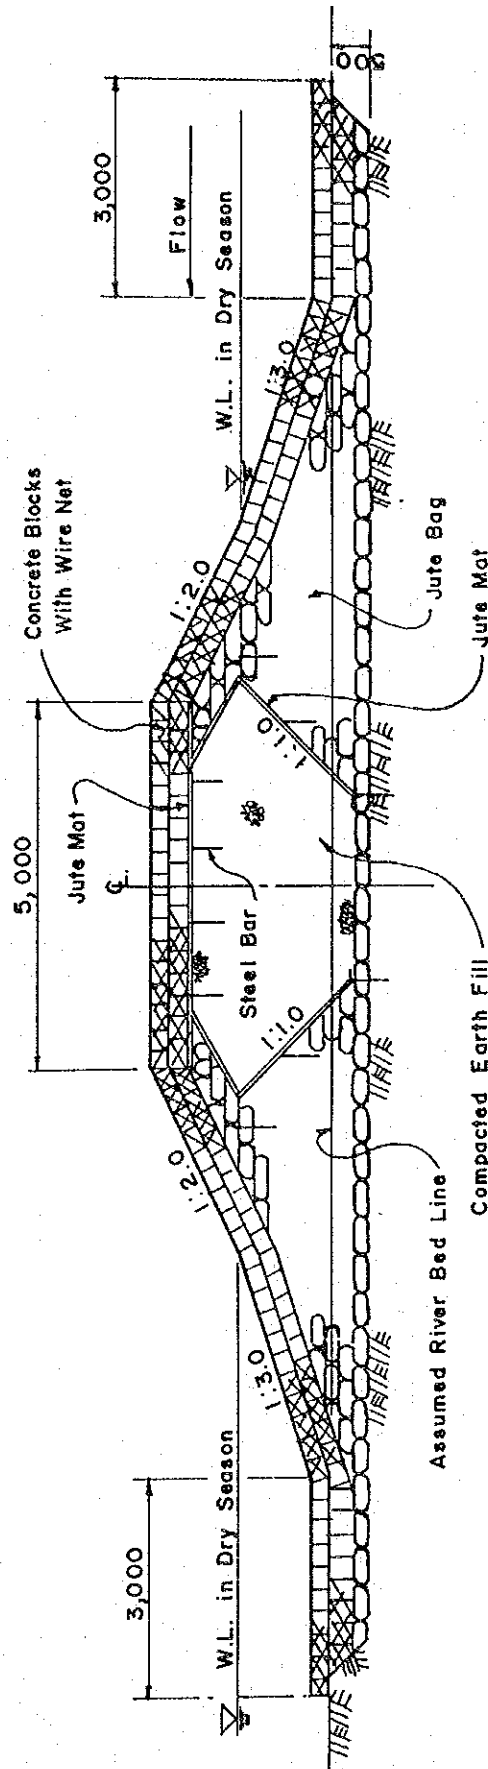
PLAN AND PROFILE OF IMPERMEABLE GROUYNE
